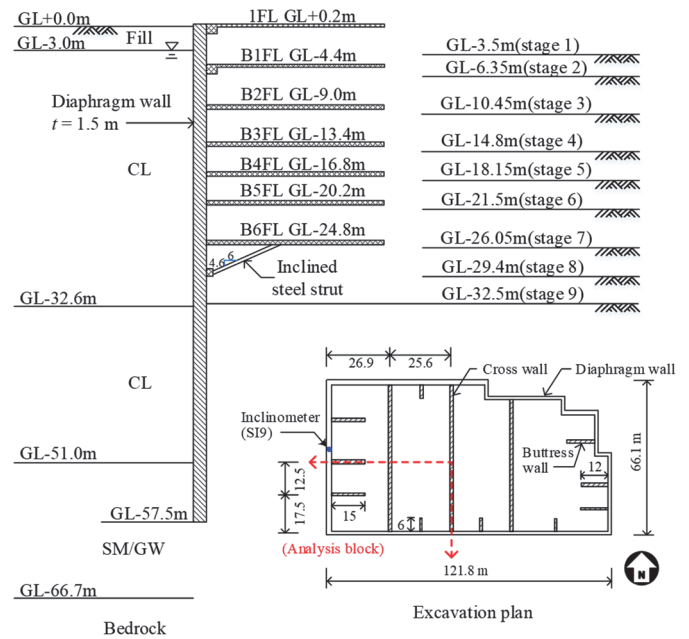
Profile of subsurface soils, excavation sequence, and excavation plan of the UPIB excavation case
